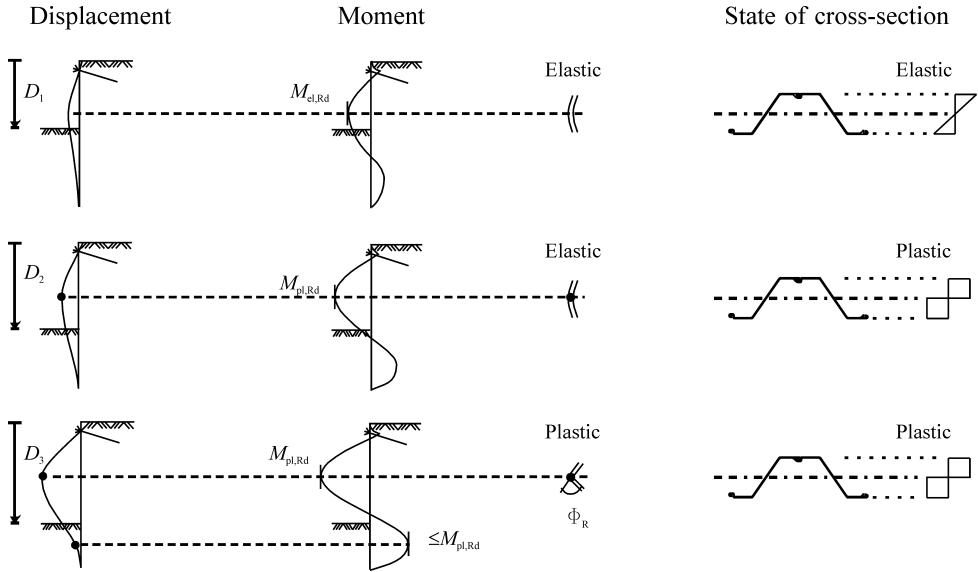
States of stress in a sheet pile wall during an excavation [38]
